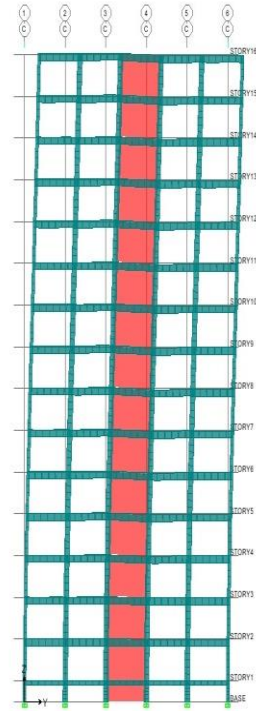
Deformed shape of G+14 storey CSW model in y-direction
